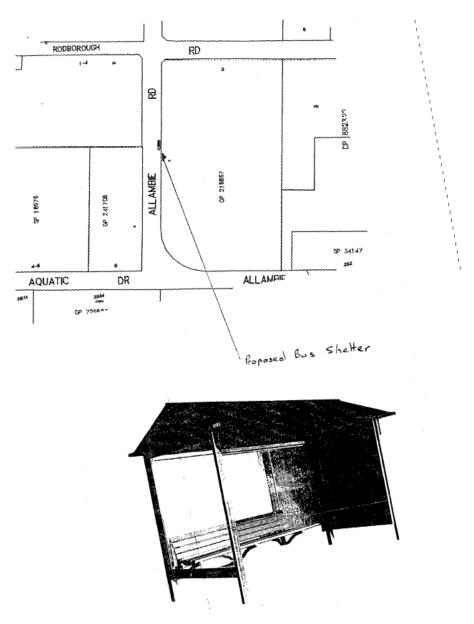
Shelter H4 DA3055 Submitted Site Plan
